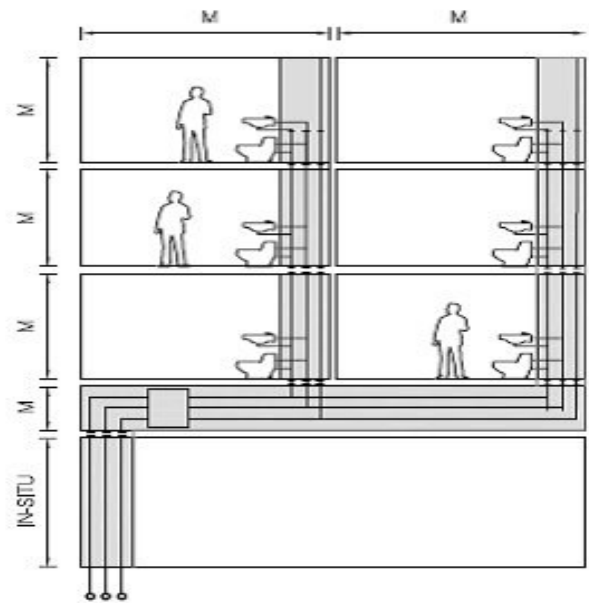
Mechanical, electrical, and plumbing (MEP) connection between vertically aligned modules. (Garrison and Tweedie 2008)
